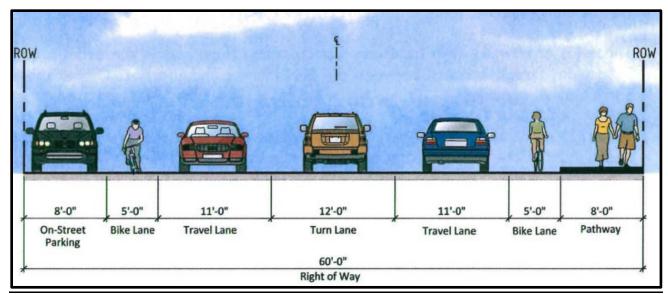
2012 Refined Streetscape Design Plan State Route 1 "interim constrained" streetscape cross section.
